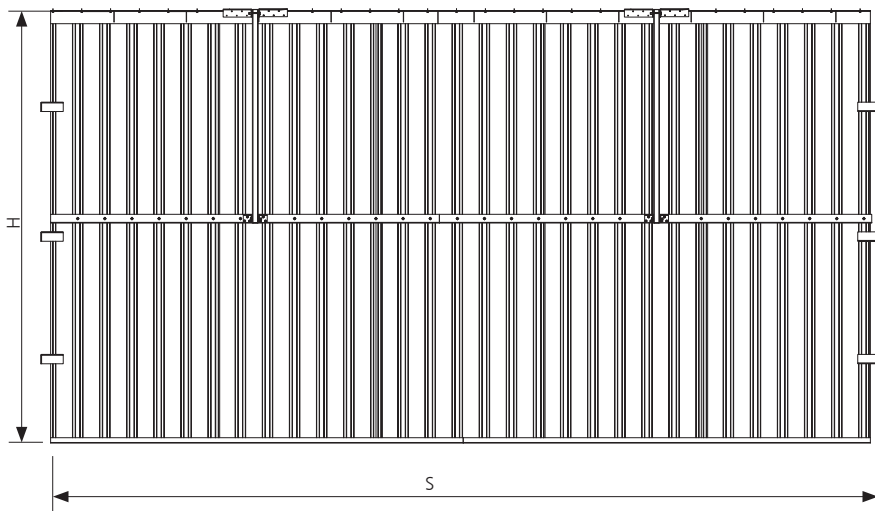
mcr Prosmoke ST Steel sheet fixed curtain.
